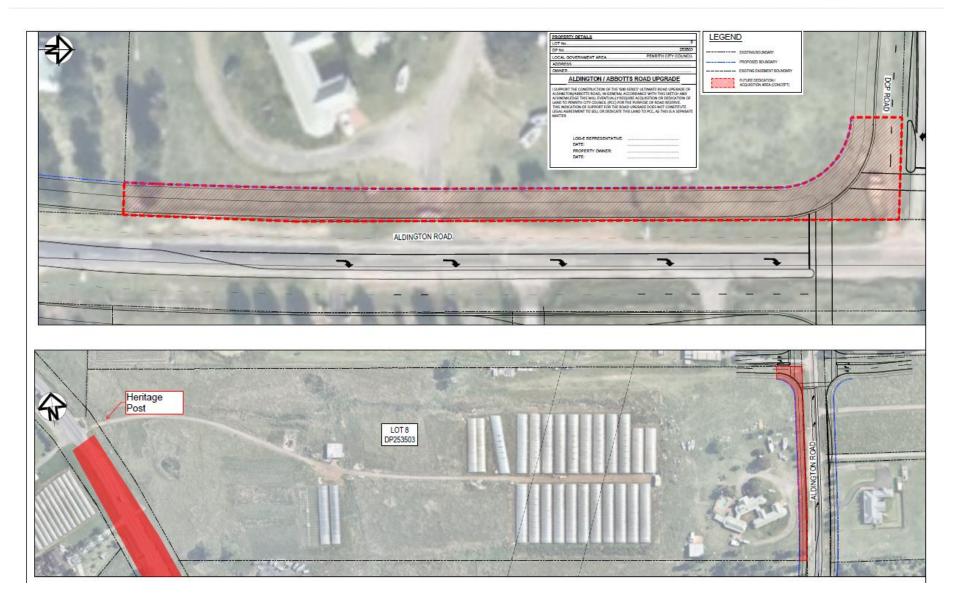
Proposed development on Aldington Road, within curtilage of heritage item Gateposts to Colesbrook (I3)
